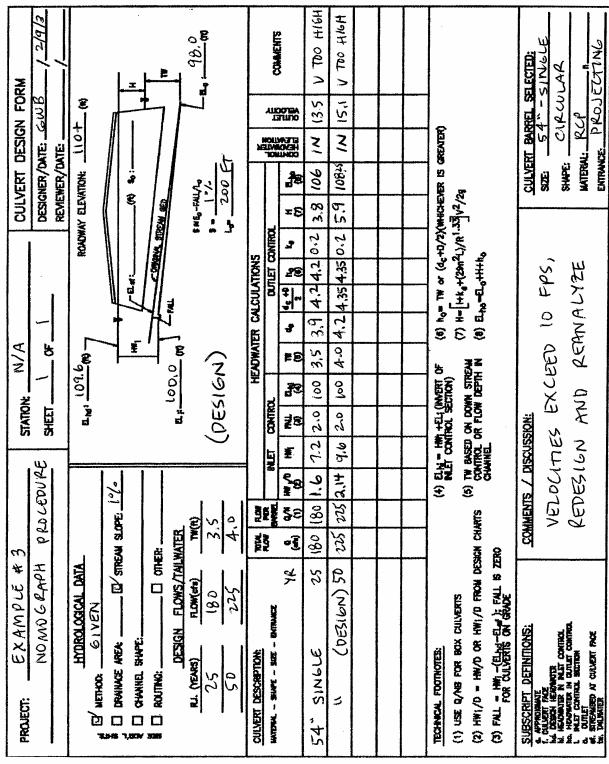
Culvert Design Worksheet for Example #3 (Federal Highway Administration, HDS, No.5)
